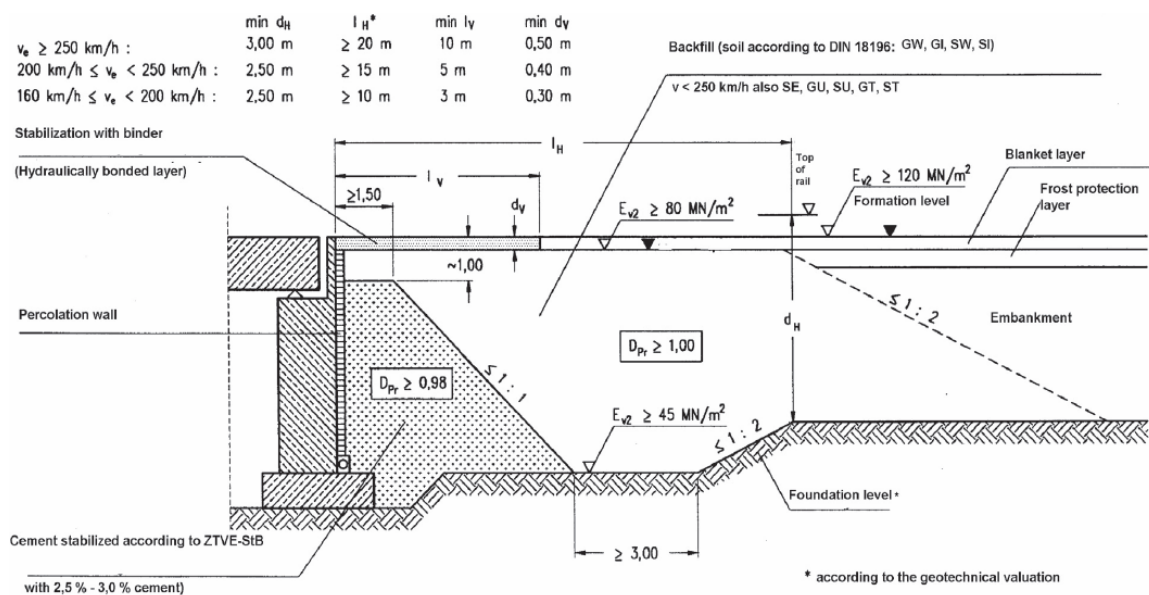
Transition between viaduct and embankment in a new railway line (DB: V > 160 km/h - UIC, 2008)
